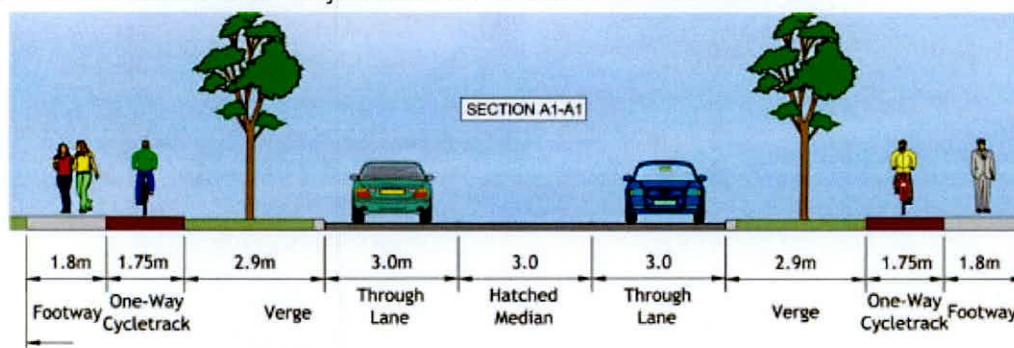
Street Geometry: Warehouse / Logistics North-South Aligned Access Road
